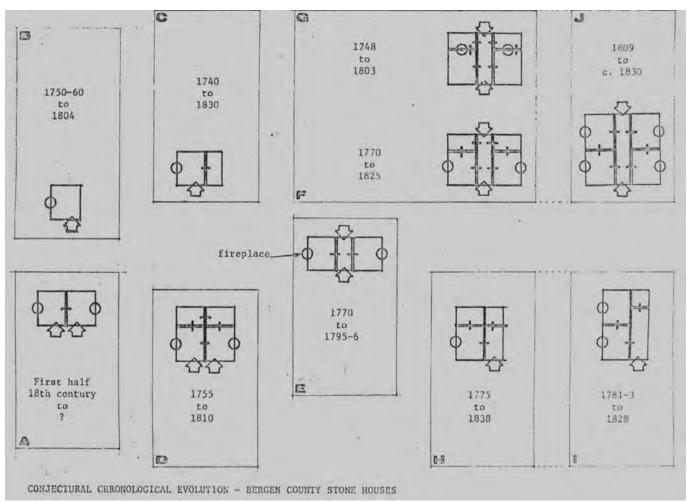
Dutch American house plan evolution as presented in the Thematic Nomination for Early Stone House of Bergen County, 1979.⁸
